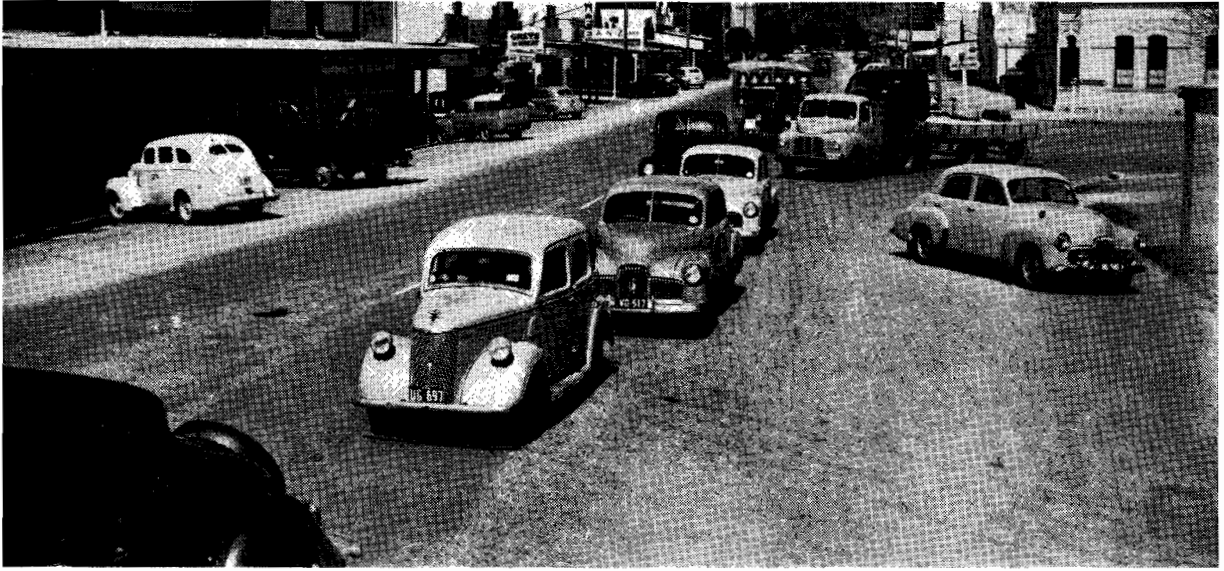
Hume Highway and Murray Valley Highway. Reconstruction and widening of heavily-trafficked section in Wodonga.
